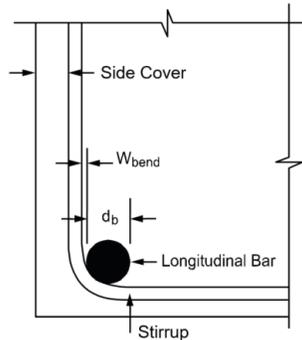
Width Due to Stirrup Bend (spBeam Manual – Figure 2.21)
